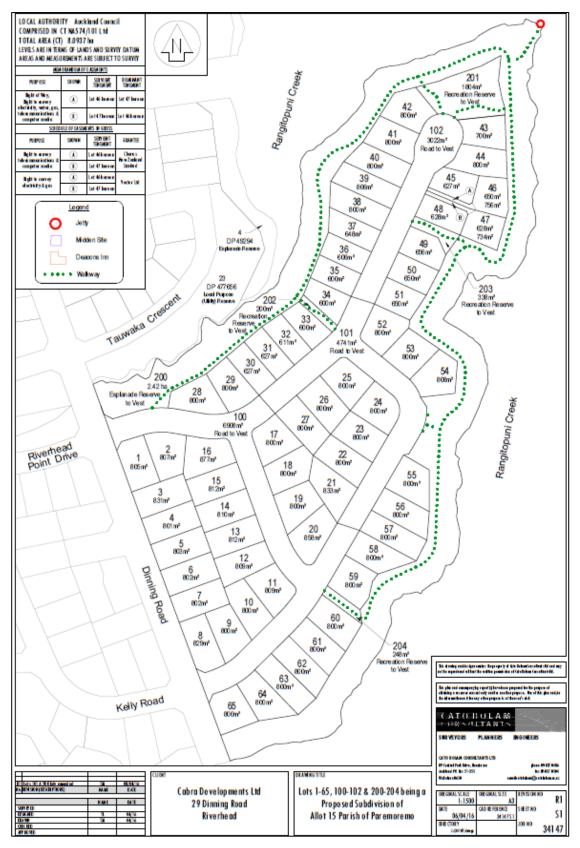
Scheme plan of the 29 Dinning Road residential development (source: Cato Bolam)
